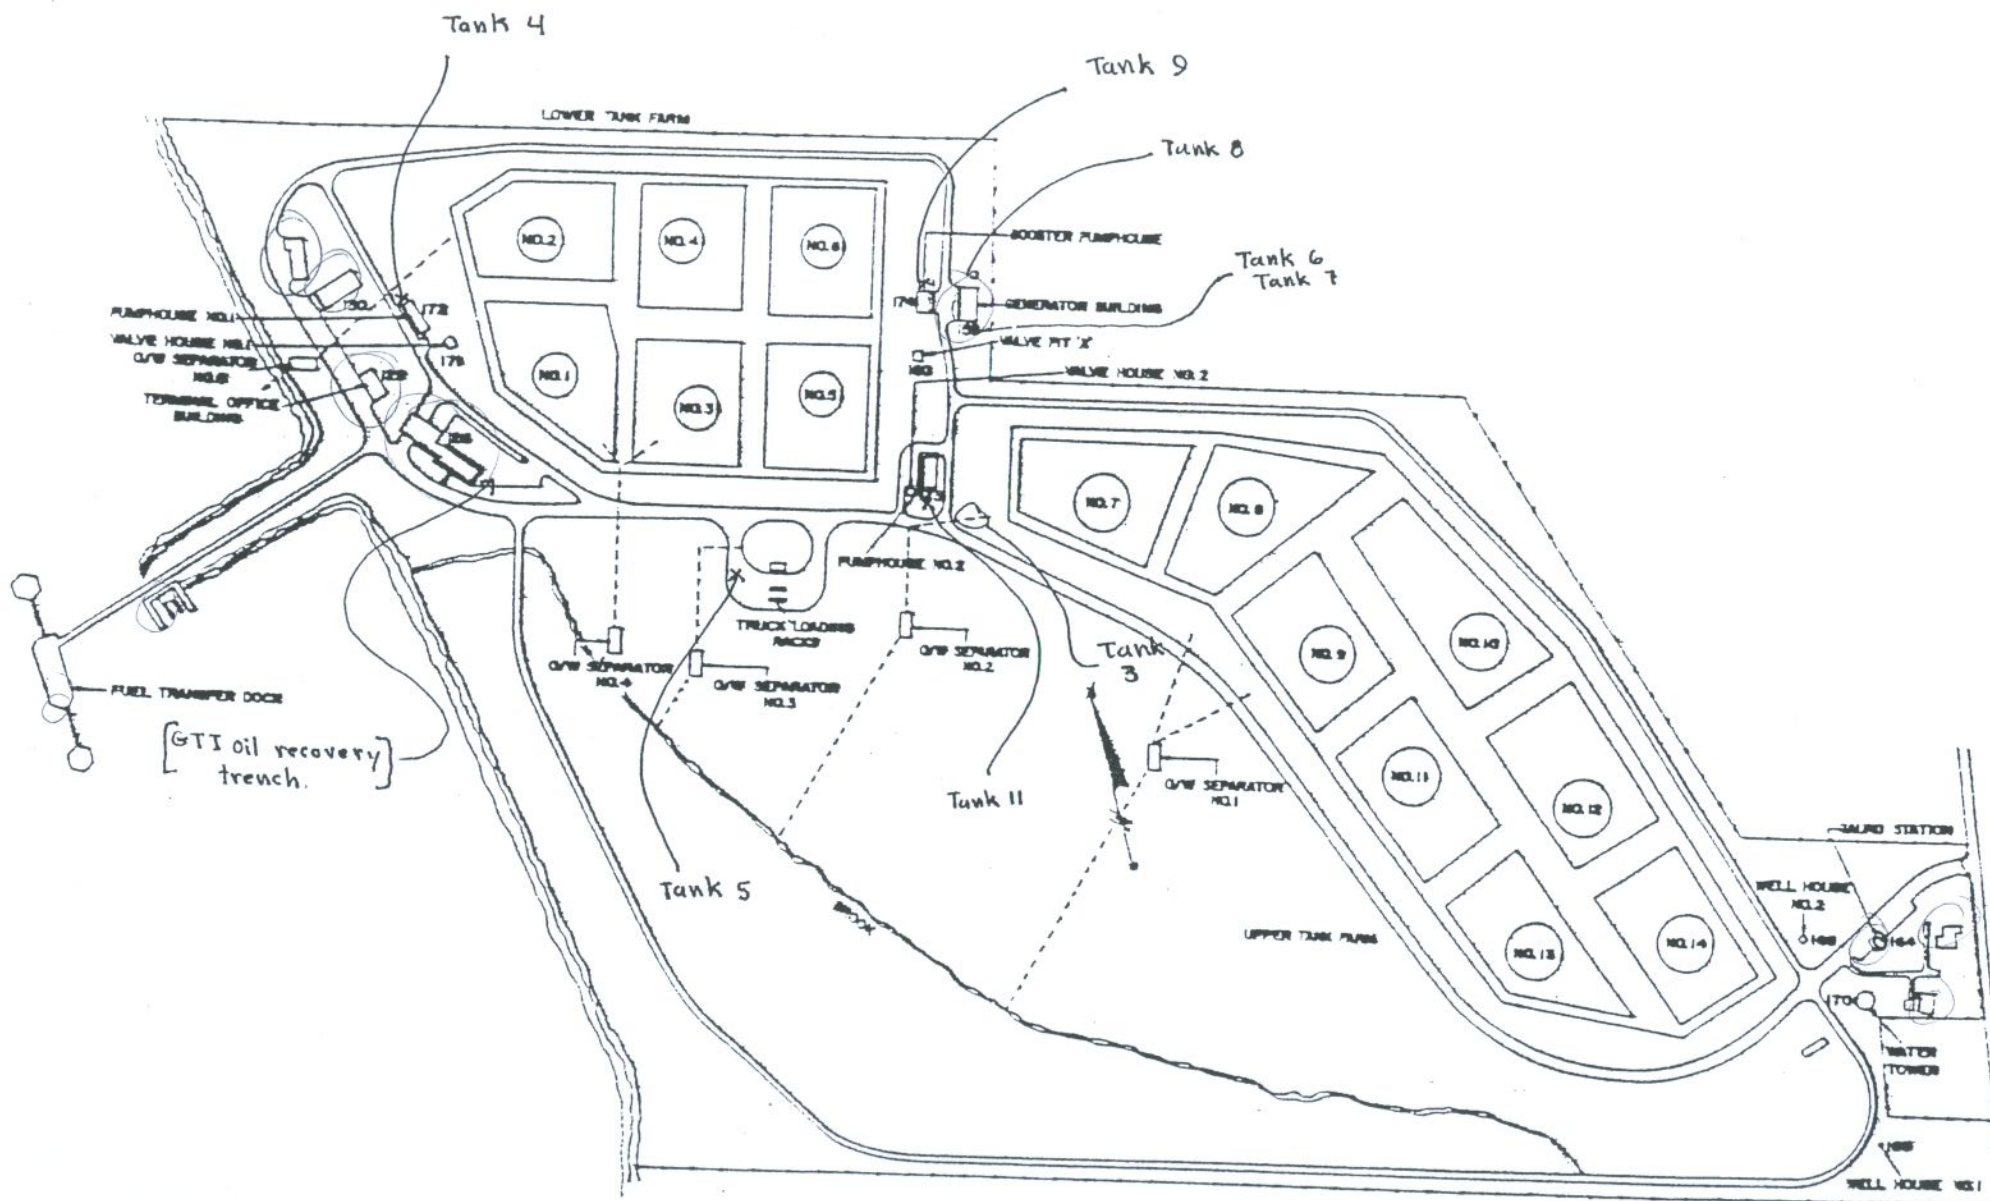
Figure DFSP CASCO BAY, FACILITY LAYOUT.
